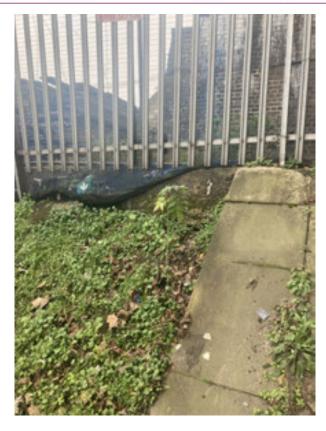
Elements of potential canalside architecture surviving by the Railway Bridge on Surrey Canal Road
